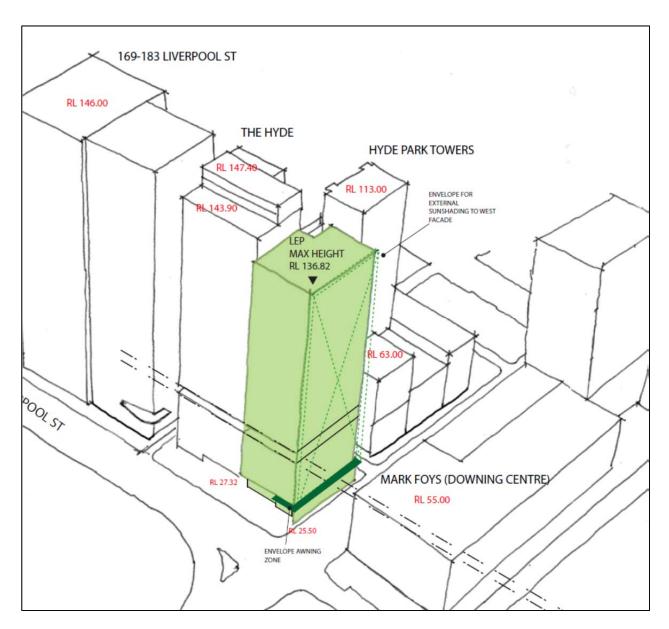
An axometric drawing of the originally lodged building envelope (to a height of 110 metres)
